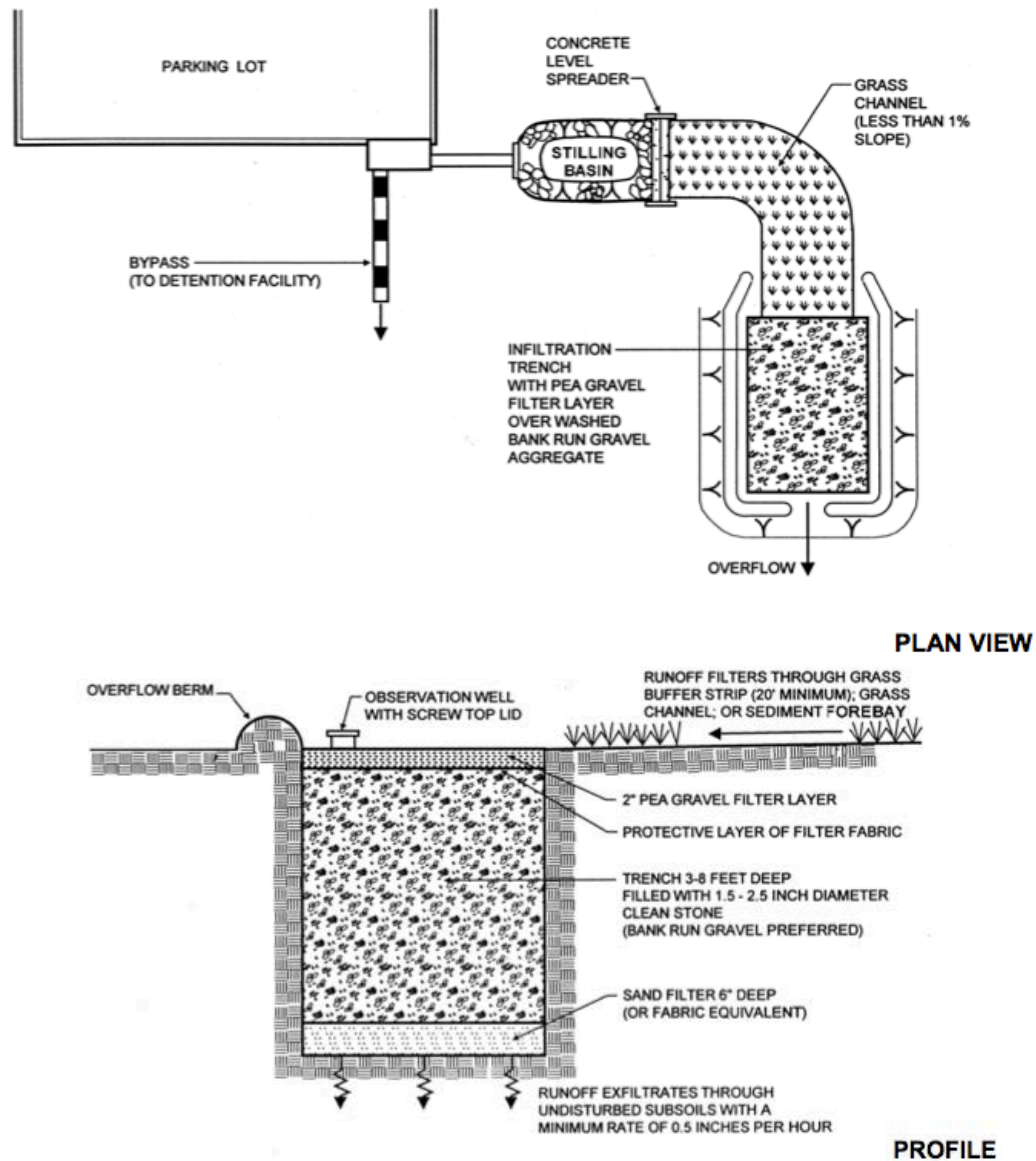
Infiltration Trench Plan and Section View (MDE, 2009)
